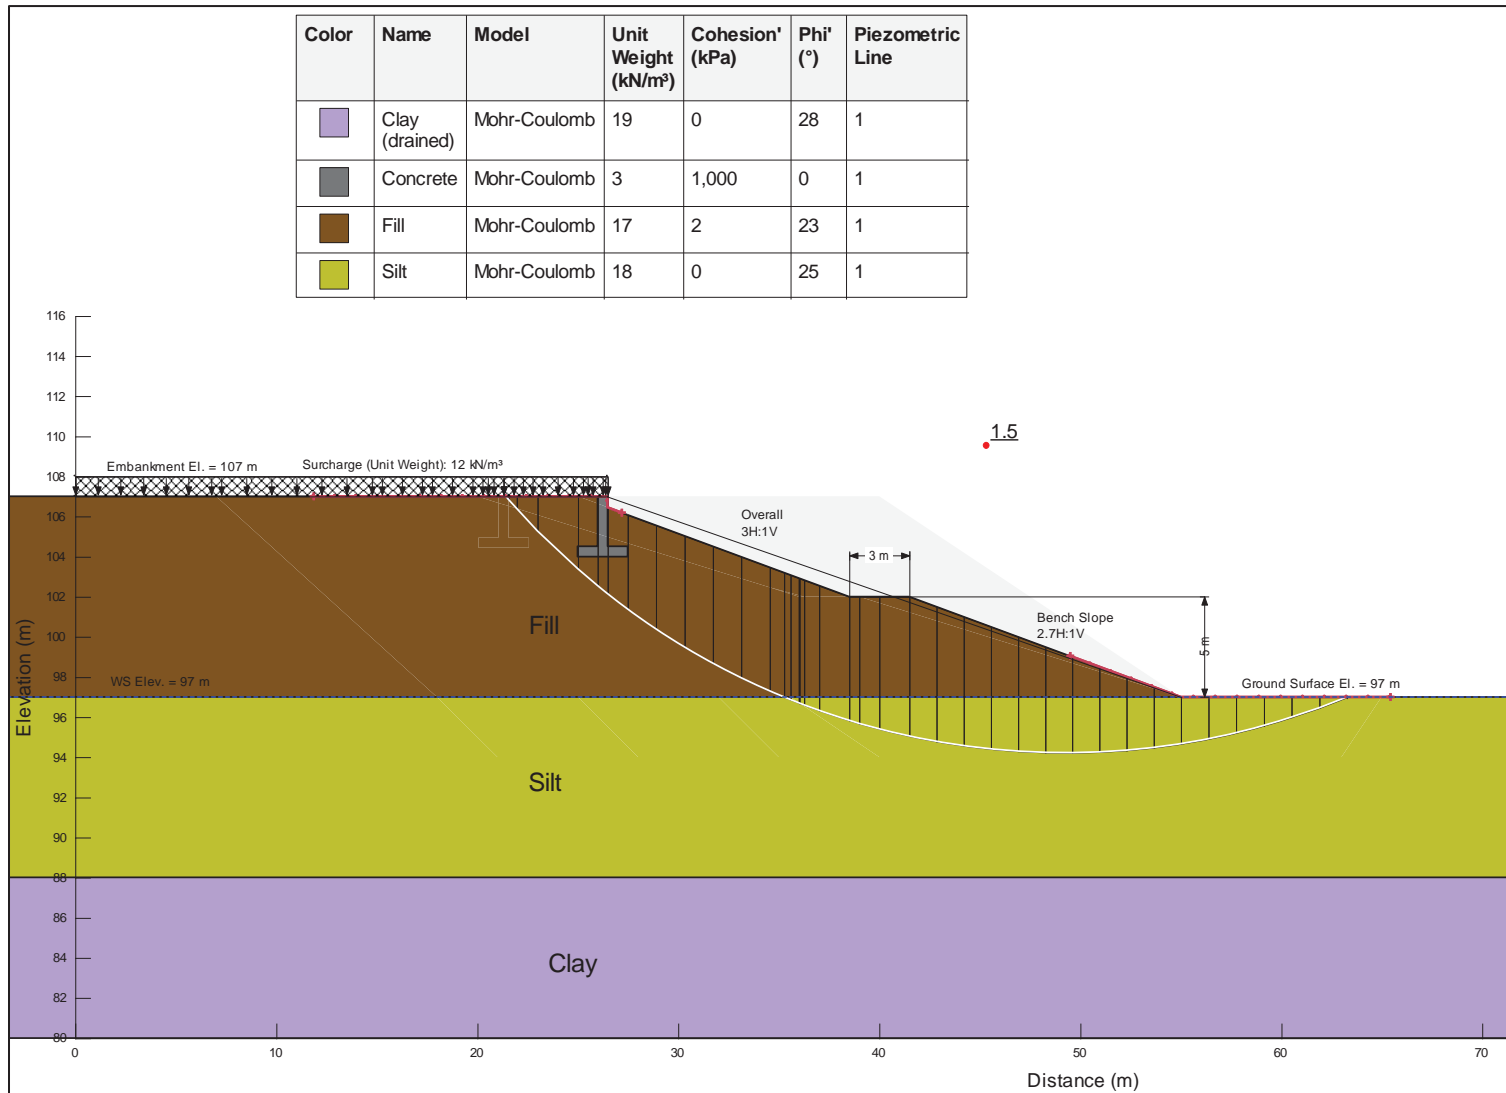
Jane St. North Embankment Long-Term (Drained) Case A2
